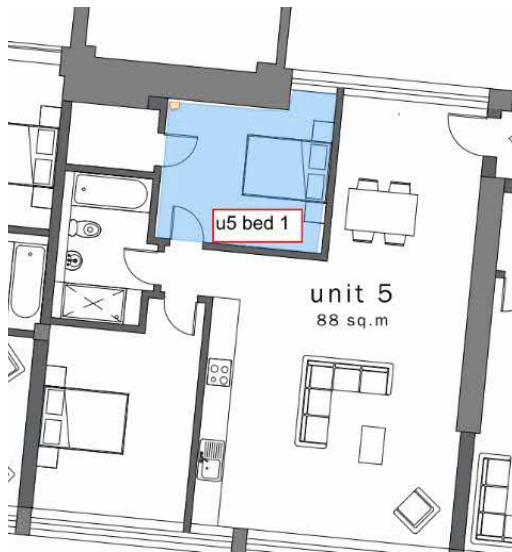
Unit 5 bedroom1 - Extract from floor plan – drawing number 1600529.2. drawn by AC at Marrons
